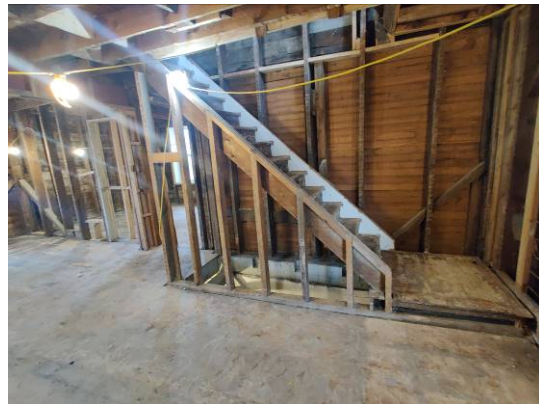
Stair in the southeast corner of the main body of the house. Note the braced corner post and the immense wall header at the second floor level.
